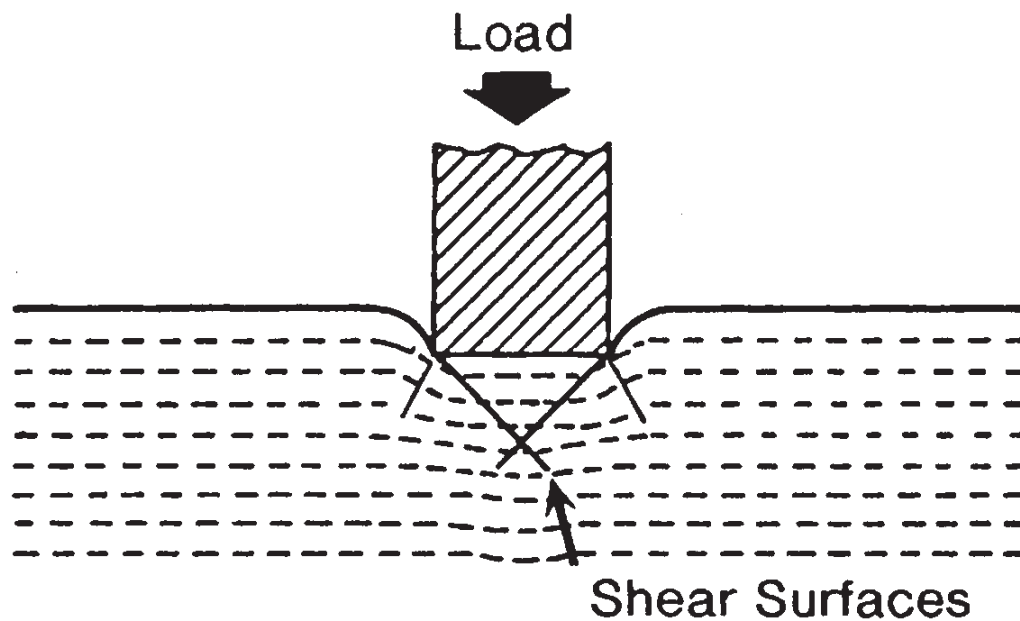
Punching shear foundation failure. (After Vesic 1963.)
